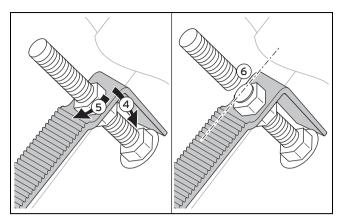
Adjusting the roof bracket; cutting off the threaded rod
